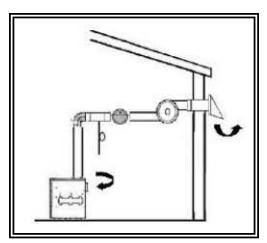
Extended Sidewall Venting See Table L for Extended Sidewall Venting
